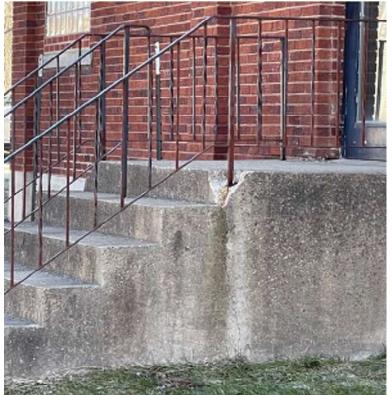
Spalling of concrete stoop with vertical cracking
